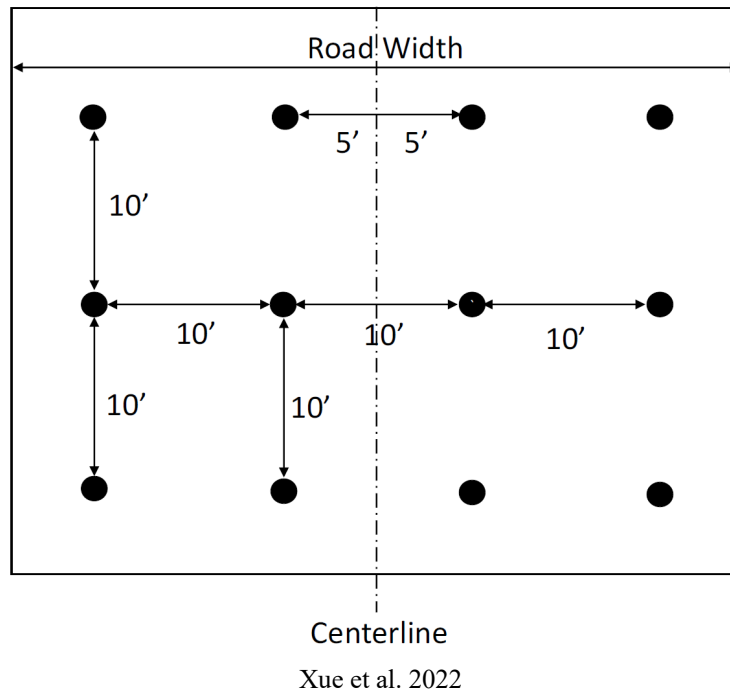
Column layout pattern for Howard County Aggregate Columns section, road width = 40 ft
